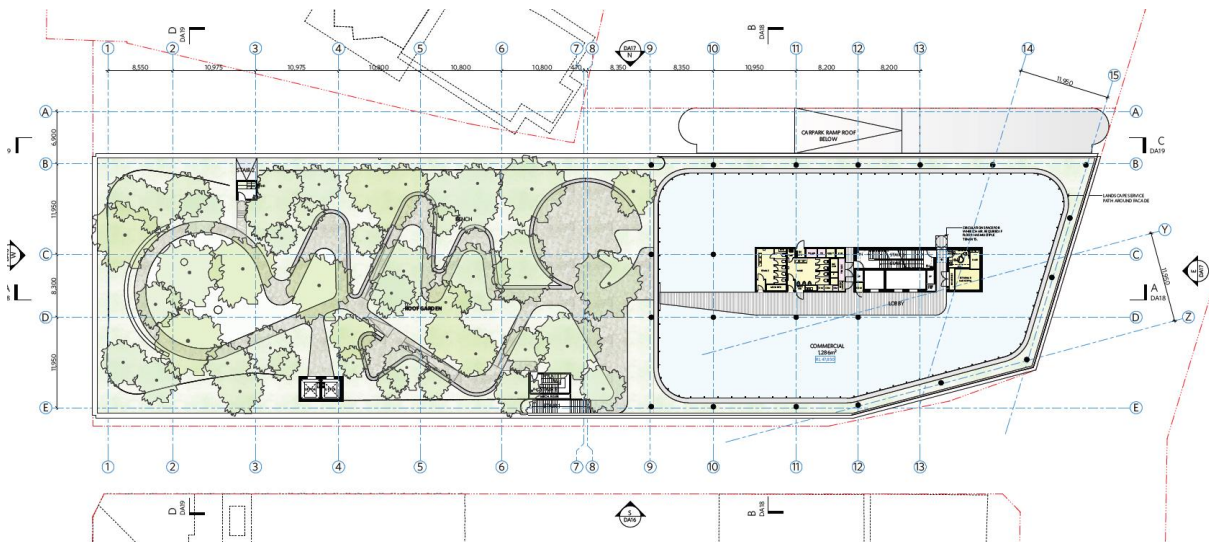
Extract of level 5 plan (Source: DBJ, Applicant Architect)
